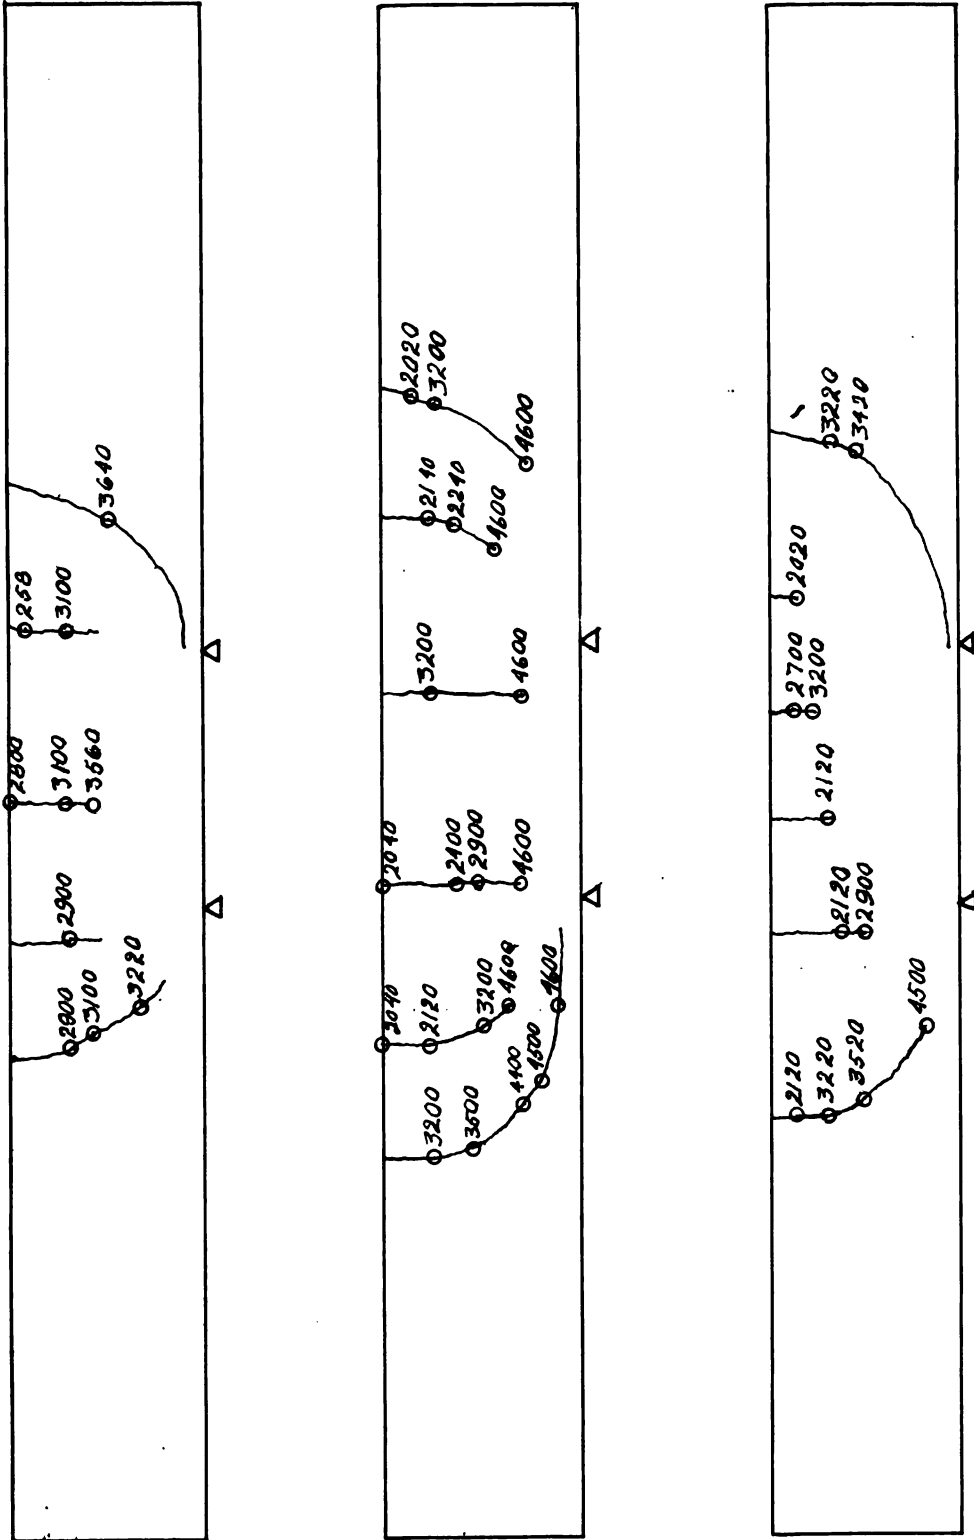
Showing Progression of Cracks on Side of Beam.
